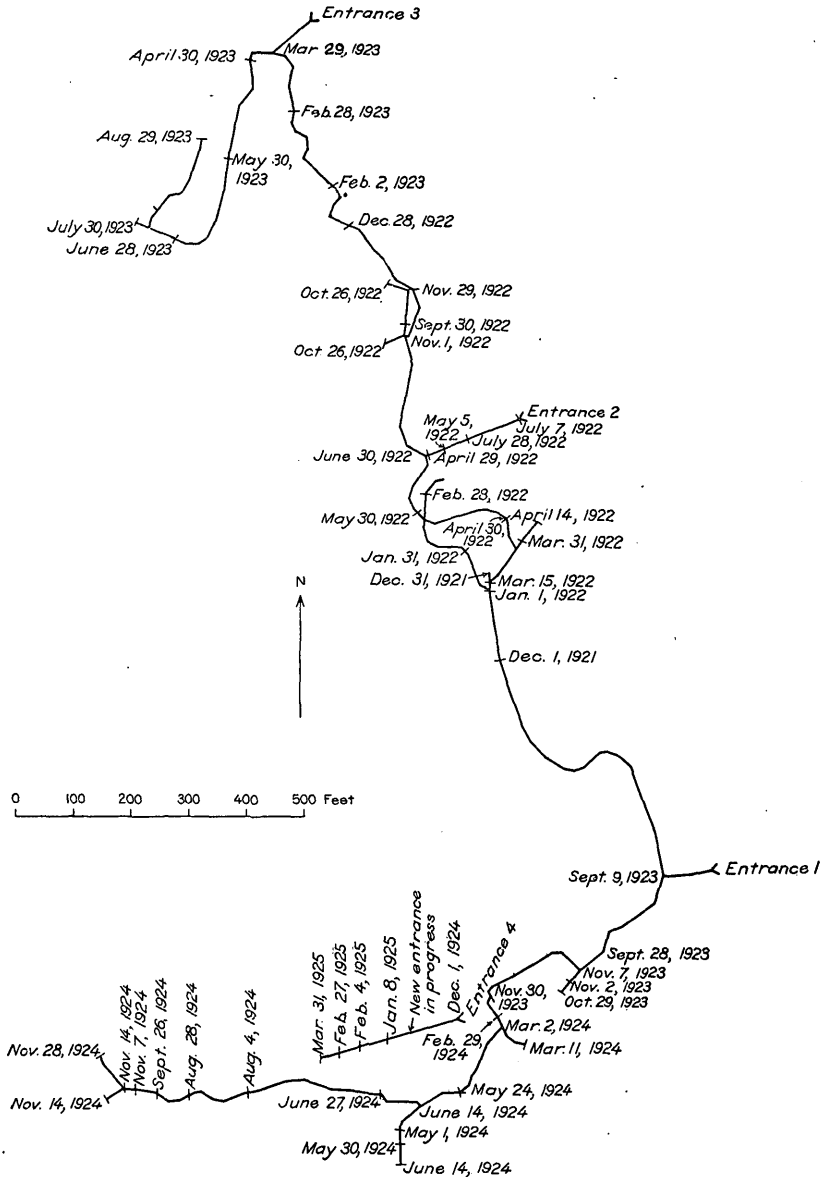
Plan of Mountain House Tunnel, Hutchinson Sugar Plantation Co., Naalehu
